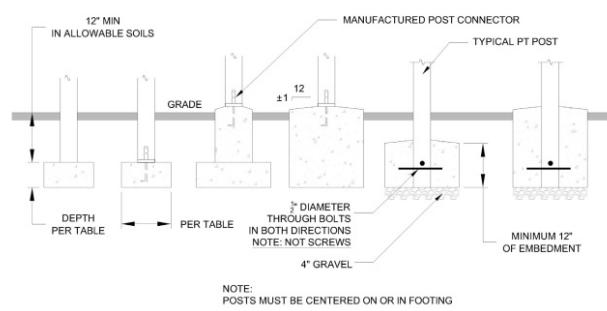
DECK POSTS TO DECK FOOTING CONNECTION
